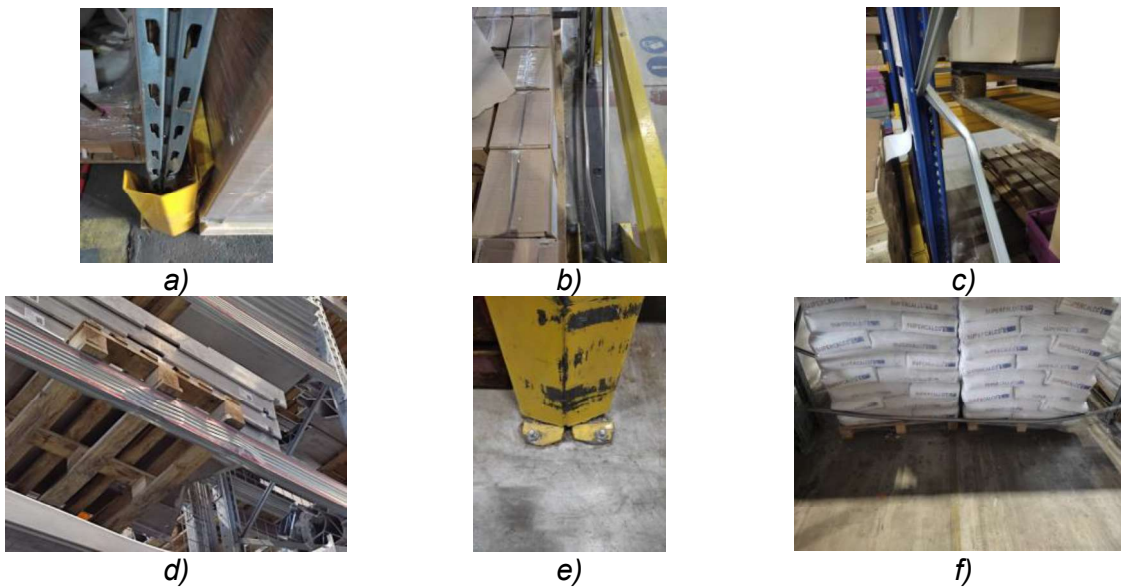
Damaged elements specification: a) upright, b) horizontal bracing, c) diagonal bracing, d) beam, e) column protector, f) pallet stopper
